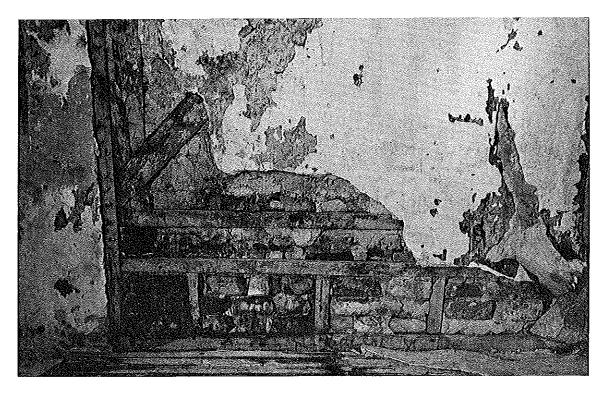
Standing architecture at 14EW119. Detail of timber frame wall at Structure 1.
